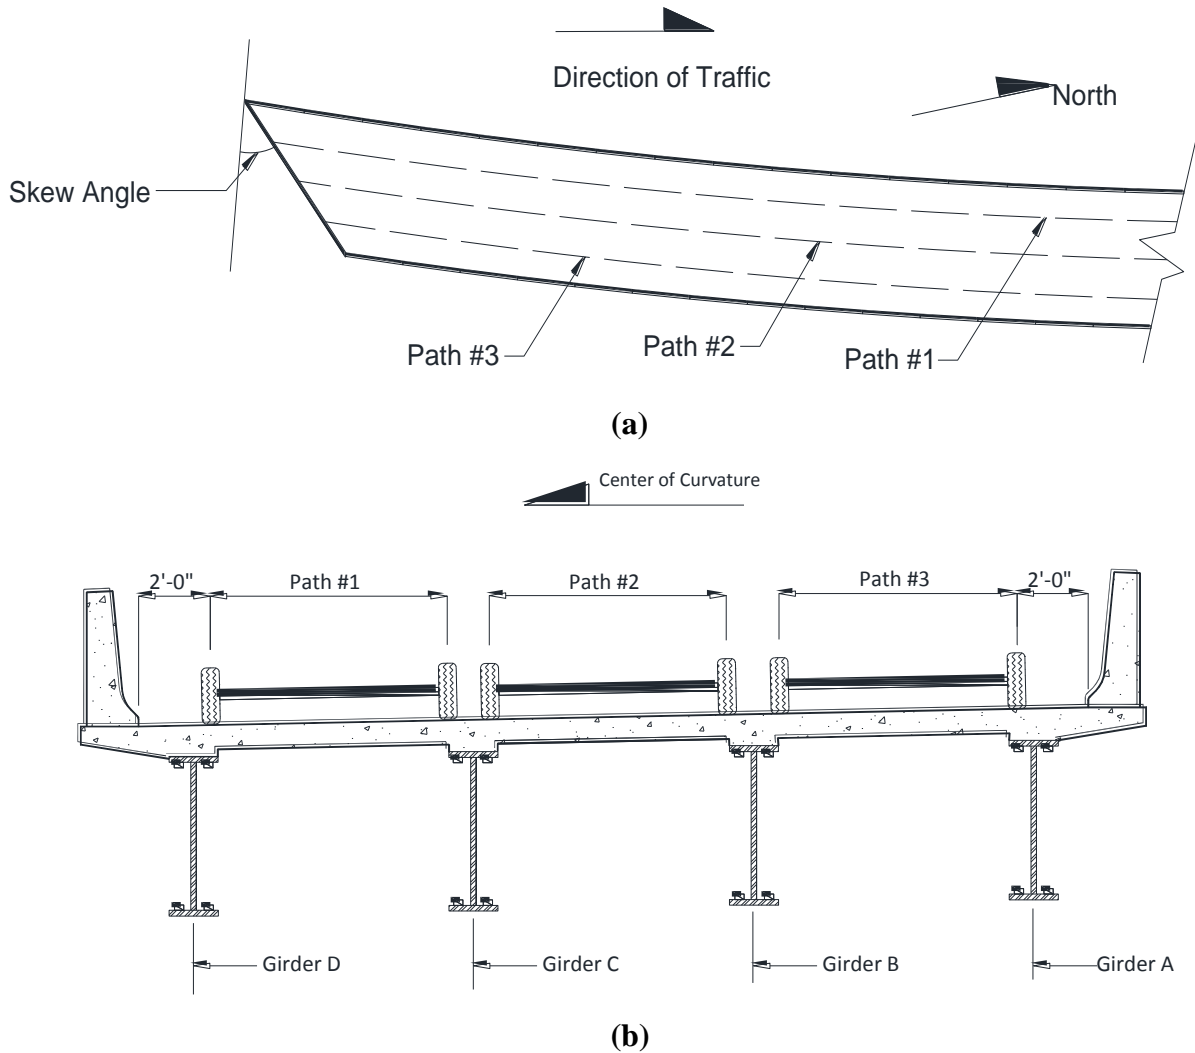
(a) Plan View and (b) Cross Section View of Load Path Placement
